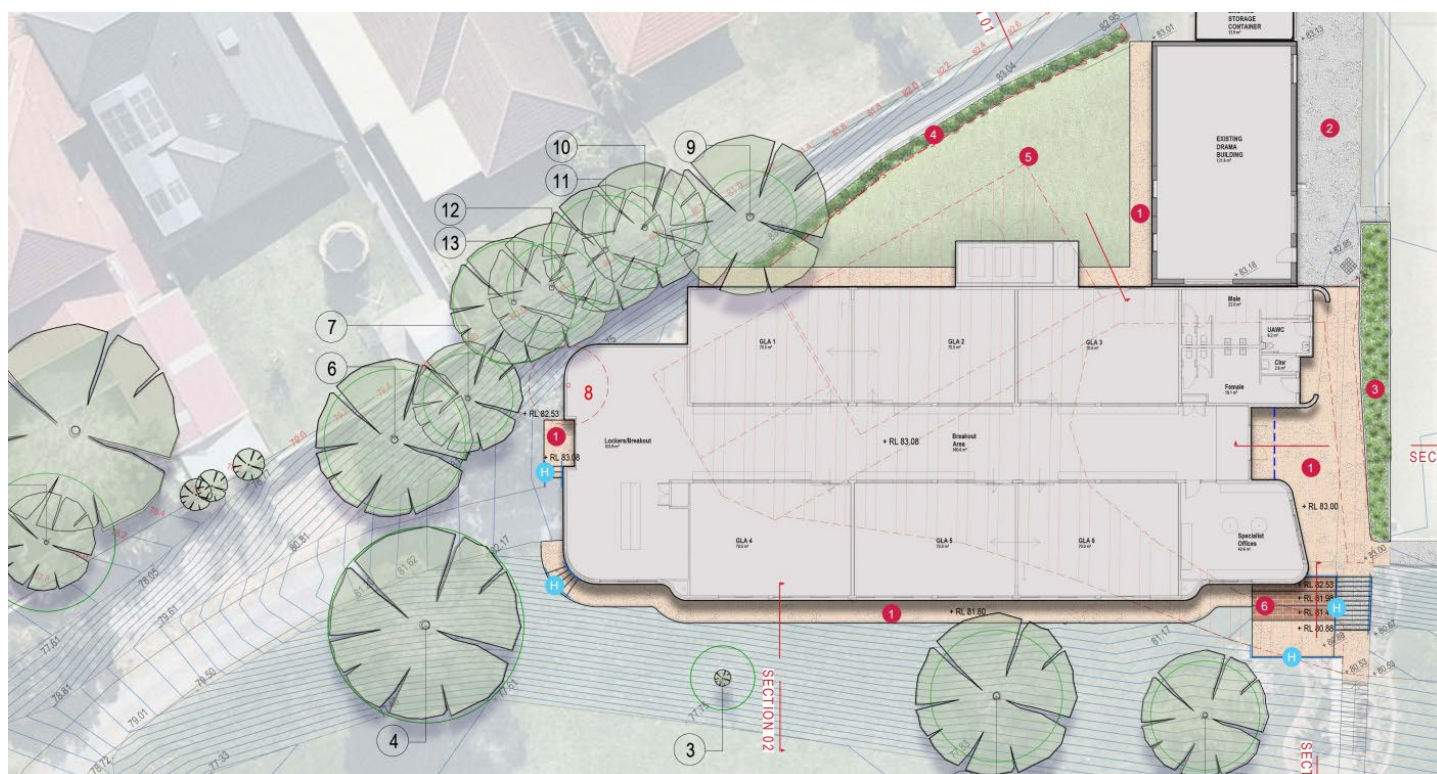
proposed landscaping plan showing vegetation to the northern boundary
